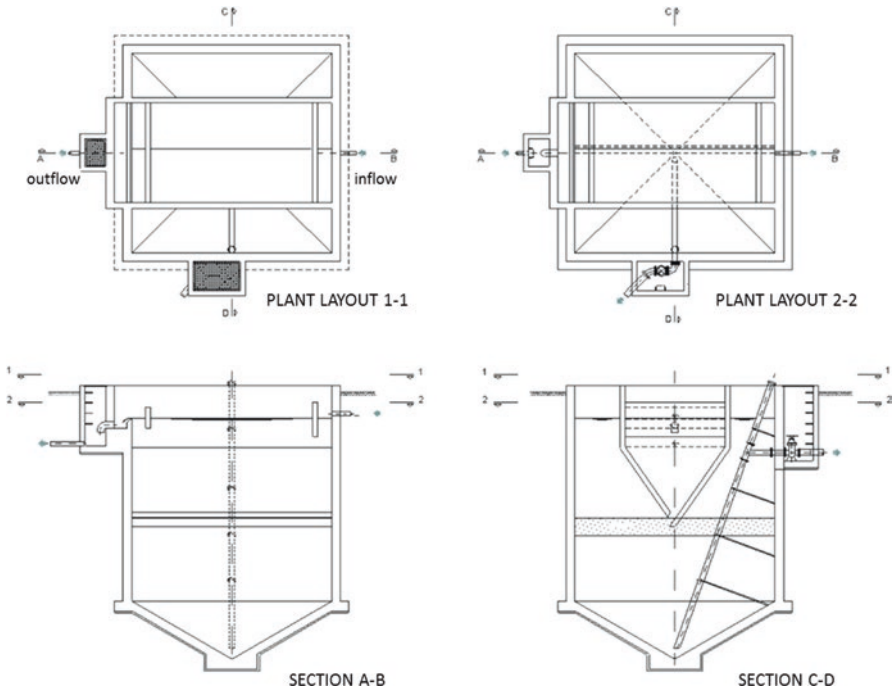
Schematic layout and sections of an Imhoff tank
